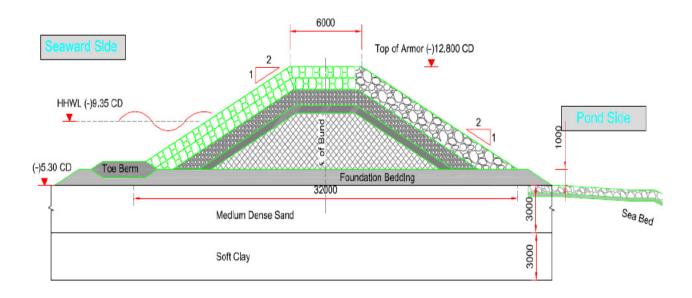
Typical cross section of Rubble mound bund with bedding and toe protection
